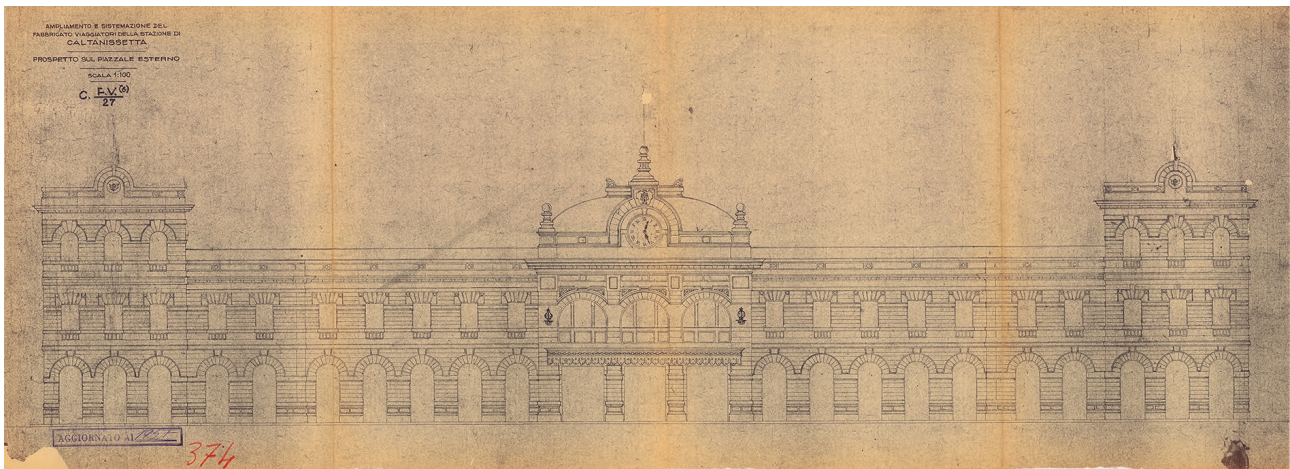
| Caltanissetta Centrale Station in Archivio Fondazione FS Italiane, collection Disegni di stazioni, “Stazione di Caltanissetta Centrale”, f. 376.
